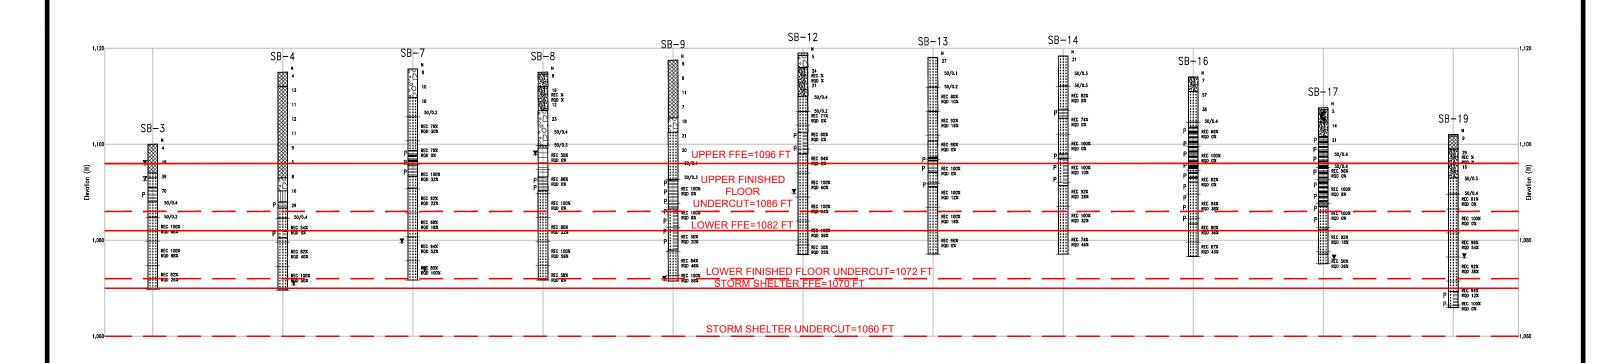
CONCEPTUAL BUILDING UNDERCUT/REPLACEMENT AT CROSS-SECTION B-B
